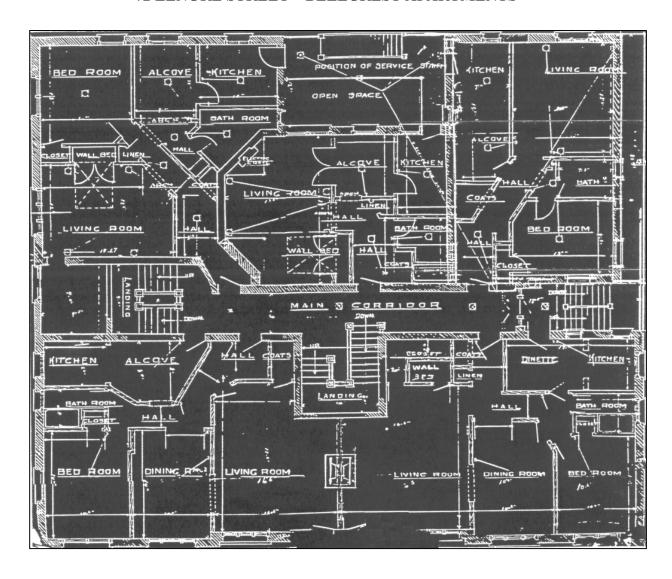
Plans for the "Biltwell" (Bellcrest) Apartments, 72 Lenore Street; "Typical Floor Plan." (Reproduced from Plans 2973/1928, held at the City of Winnipeg Archives, William Avenue.)
